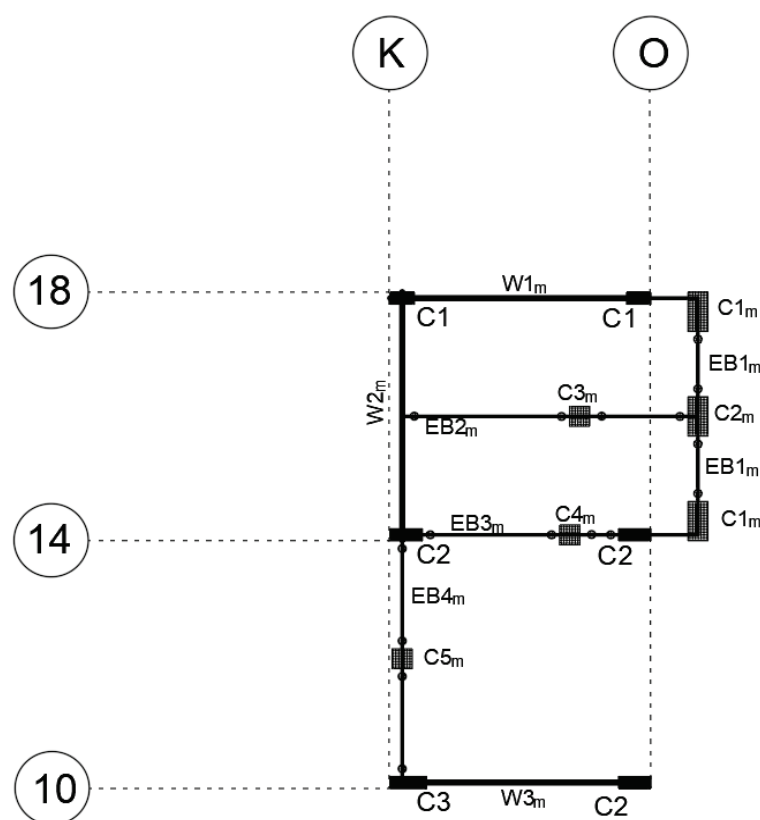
Masonry wall, infill wall, and elastic masonry beam element location and designation for an apartment unit of a typical floor.
